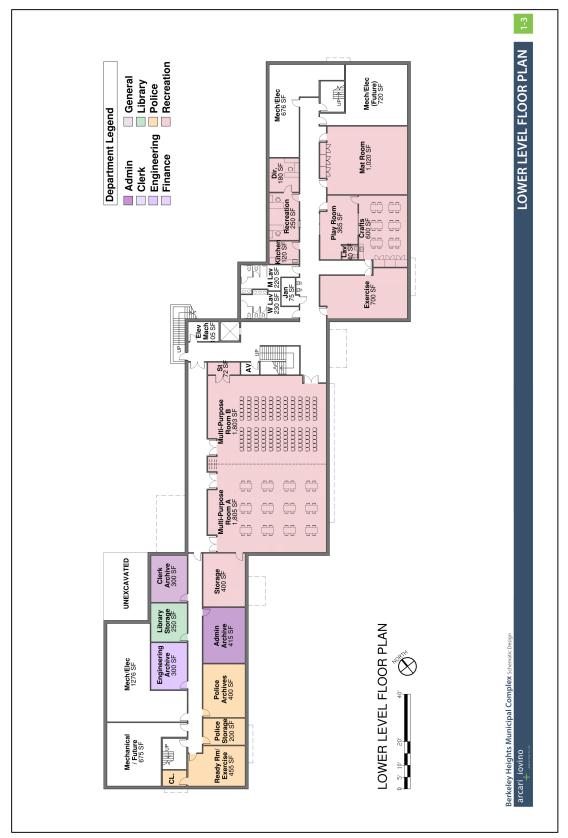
Concept Basement Floor Plan of Municipal Complex Site
